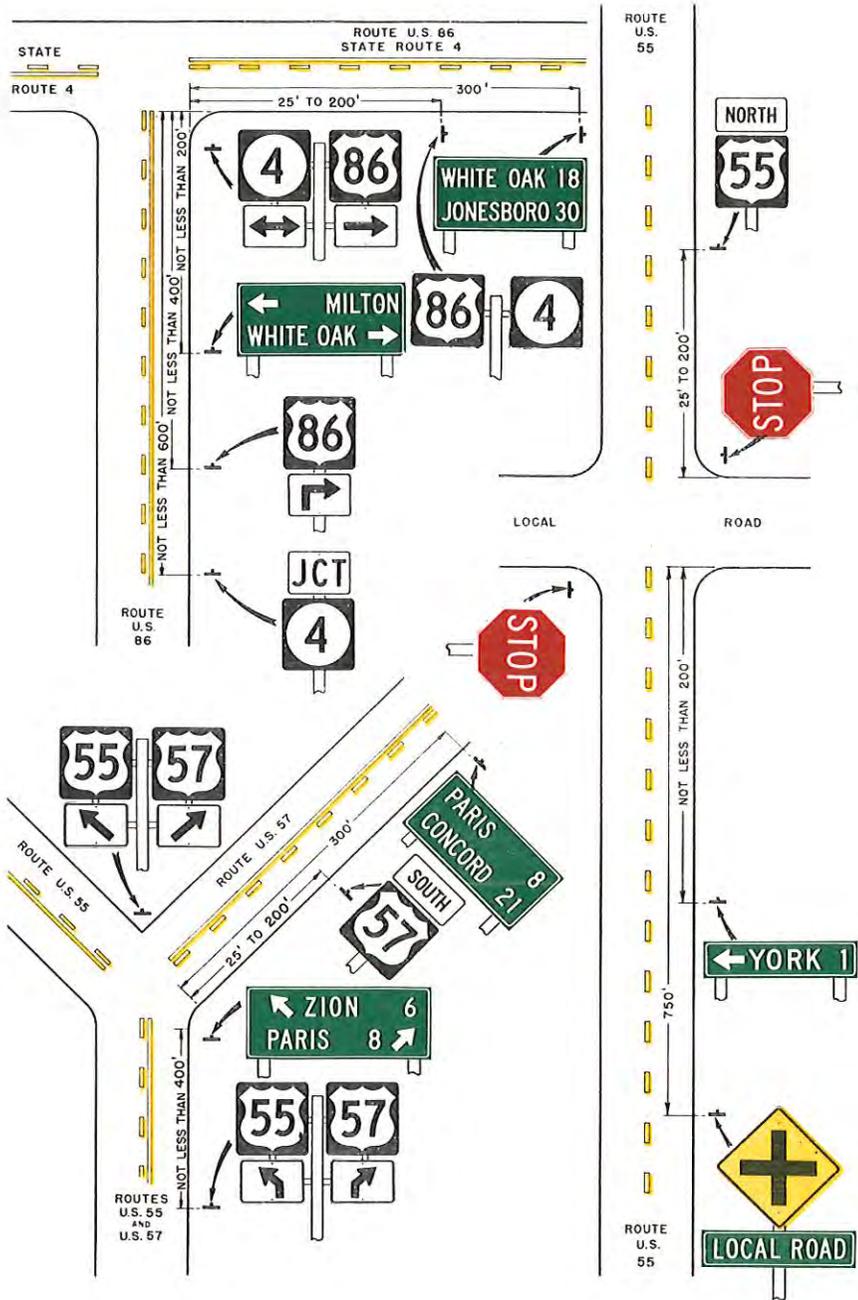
Typical route markings at rural intersections (for one direction of travel only).
